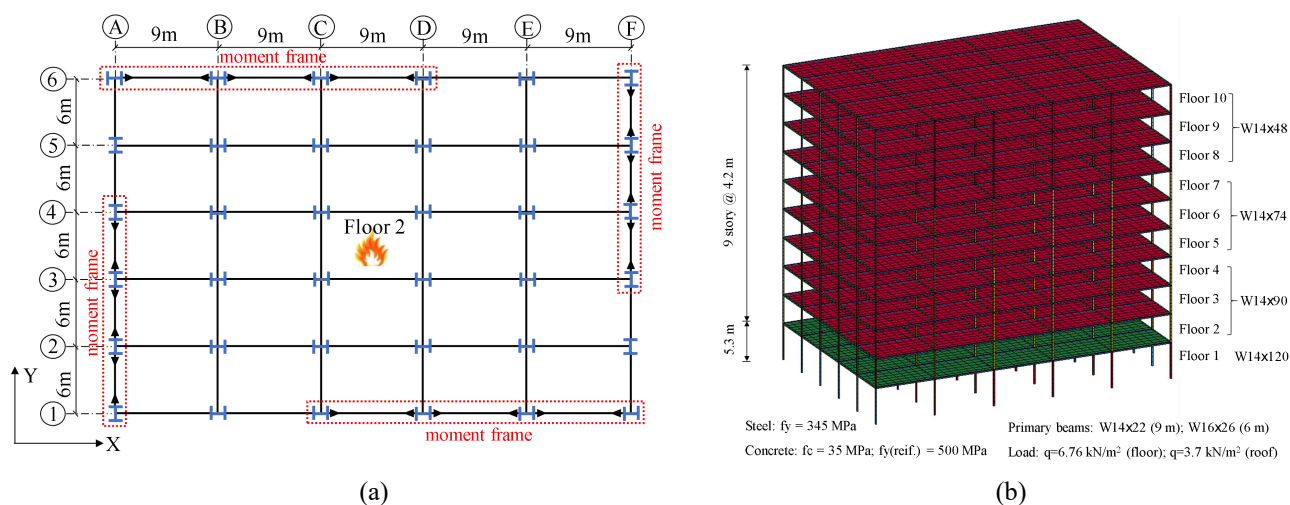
Modeling of a 3D 10-storey gravity building: (a) plan view; (b) finite element model
